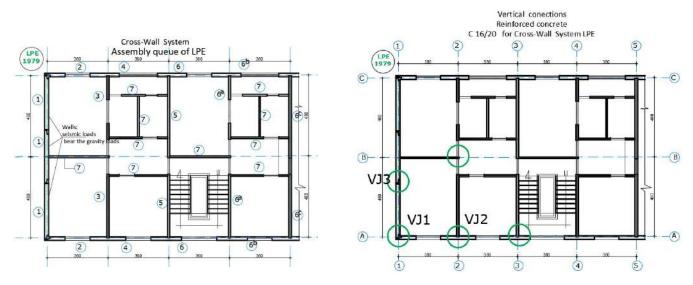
Basic Structural Configurations of large panel buildings LPE in Albania: a) Cross-Wall System and b) Vertical connections (source: AQTN)
